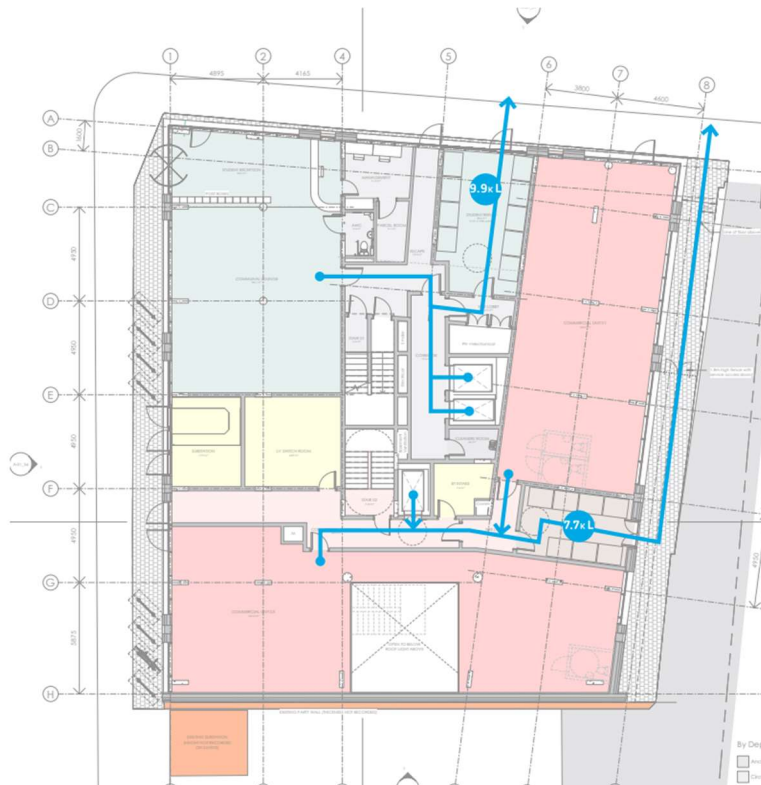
(above): Ground floor plan with student refuse and commercial refuse
